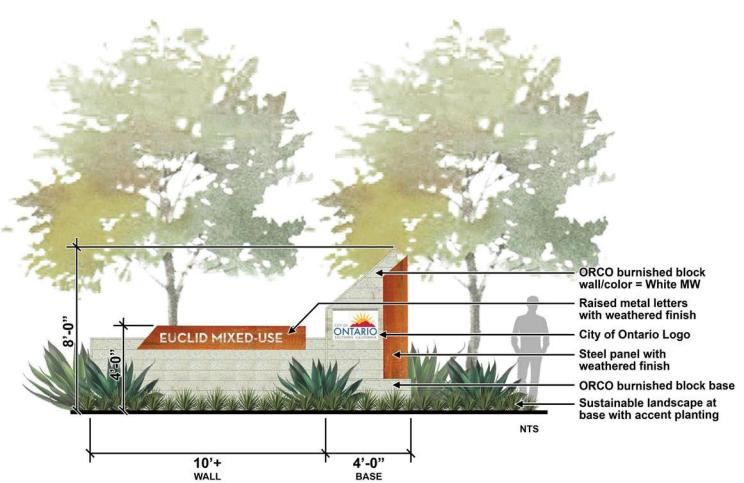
SPECIFIC PLAN GATEWAY CONCEPT
